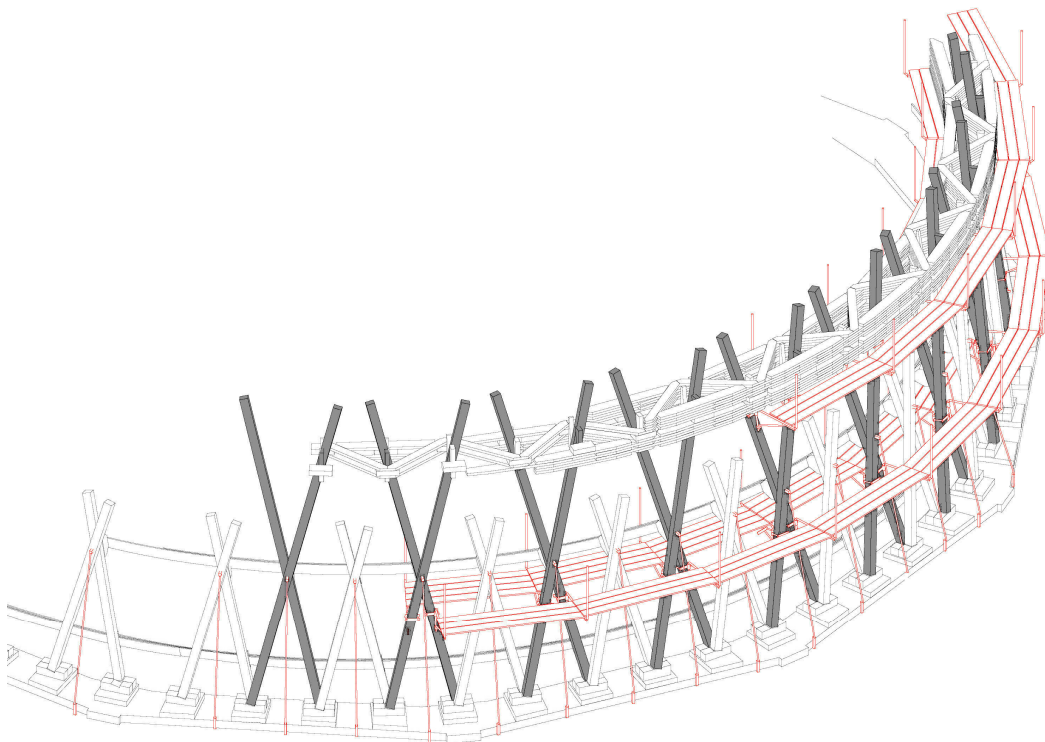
Assembly sequence for the cooling tower in Severouralsk
